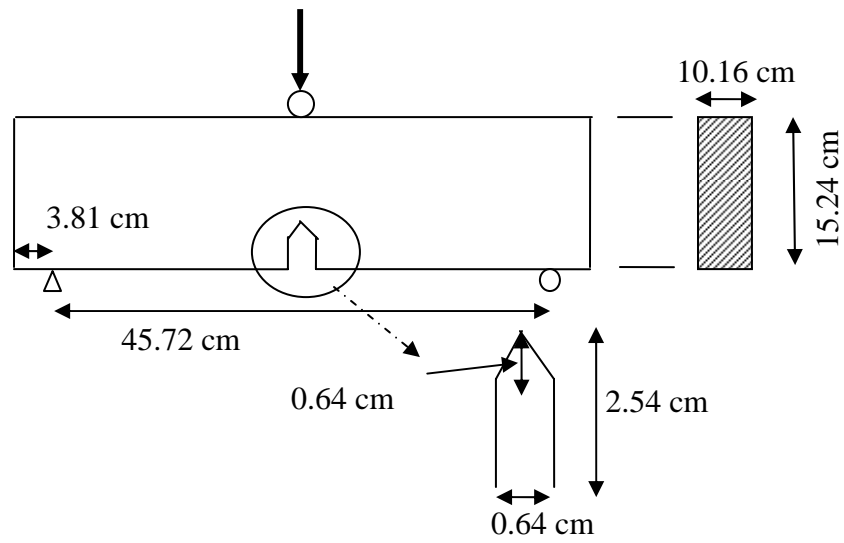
Schematic view of a notched-beam for fracture energy test: geometry and dimensions
